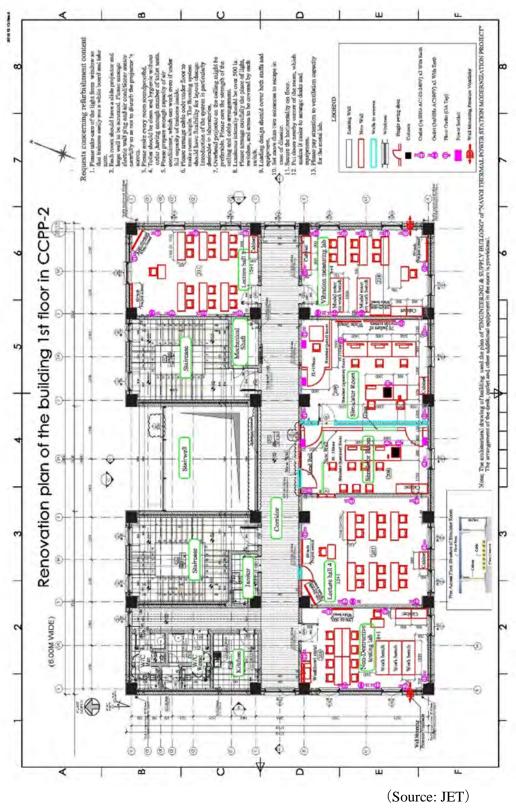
Layout of the 1st floor in NTC CCPP-2 Building
